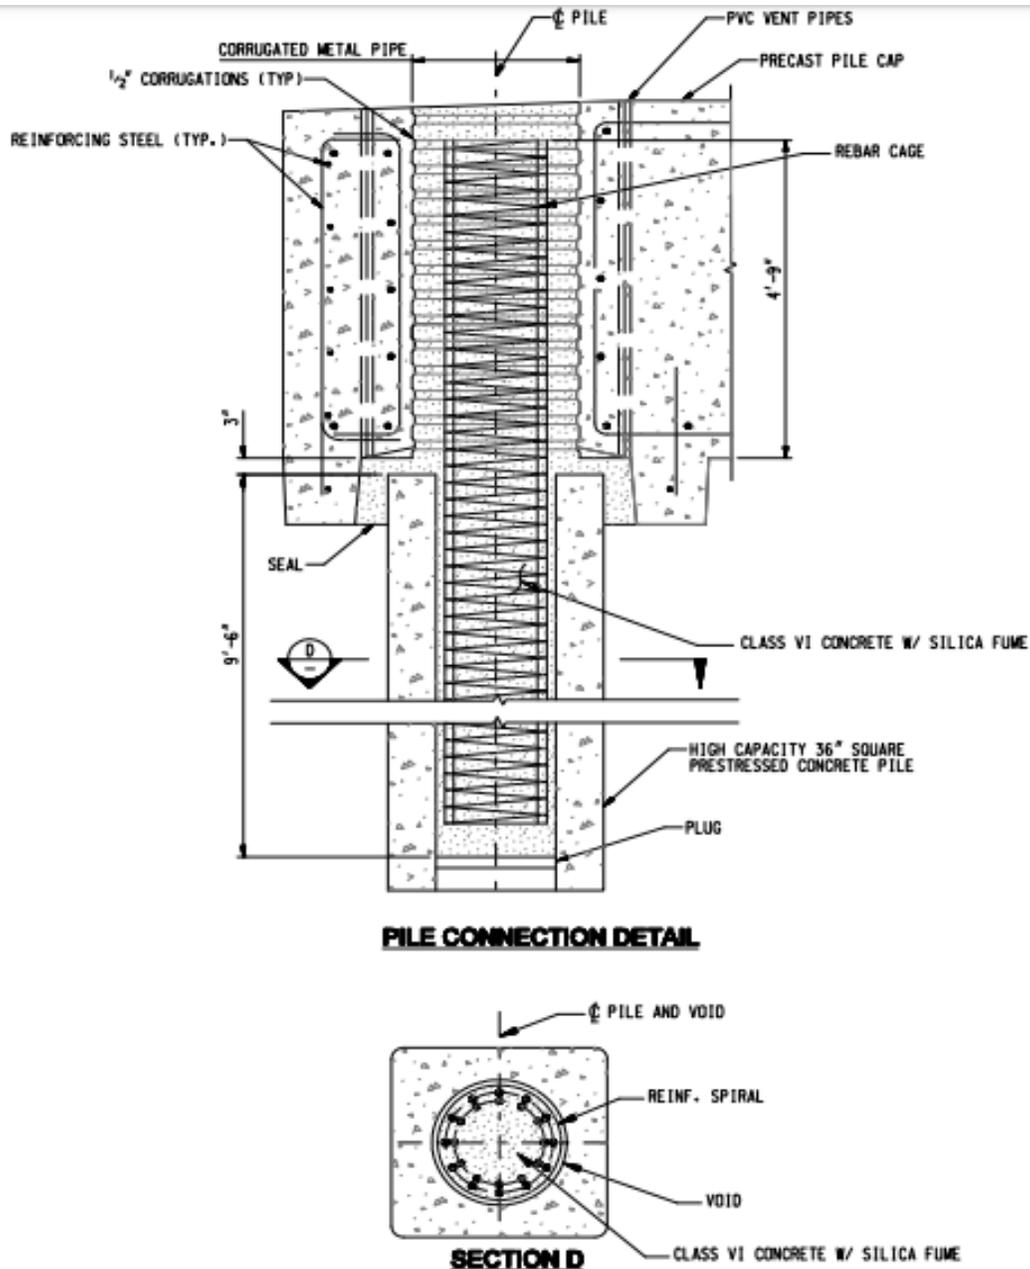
Connection details between concrete square pile and pile cap [2]
